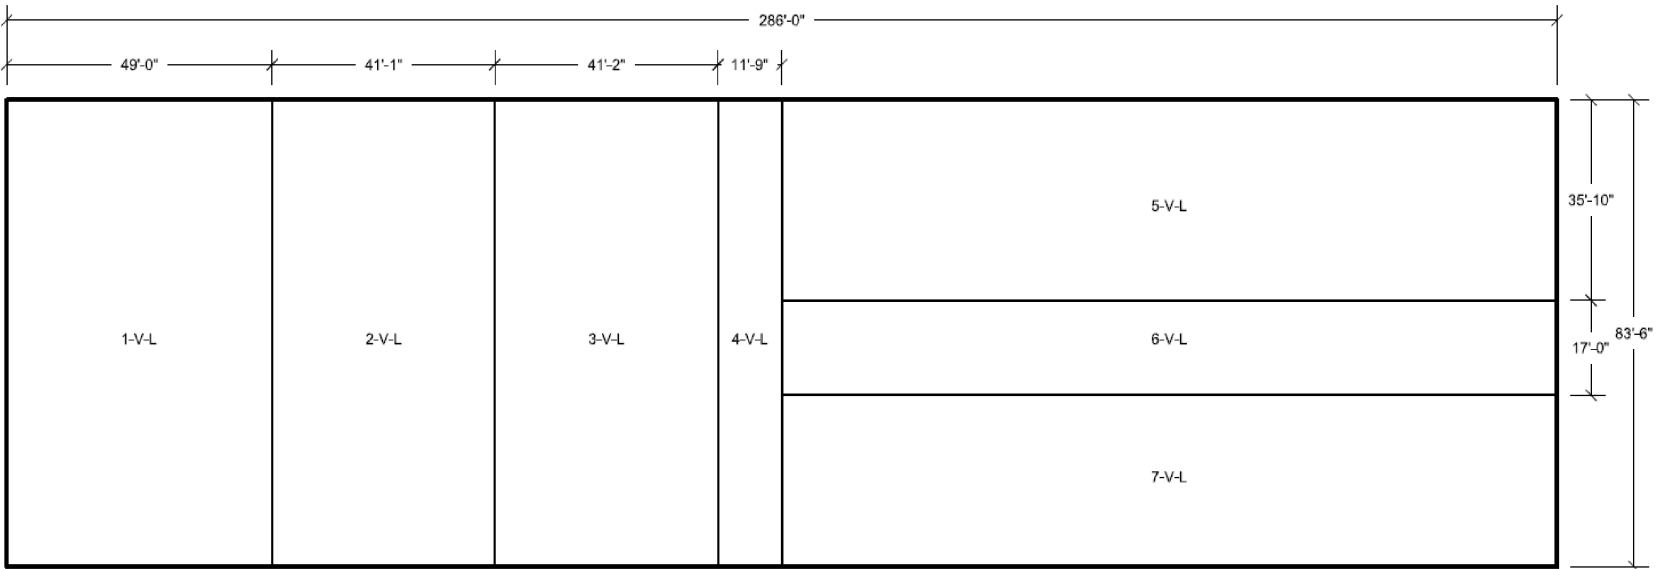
H.6-83 UHS Basin North Wall Looking South Vertical Reinforcement Zones Near Side Face
